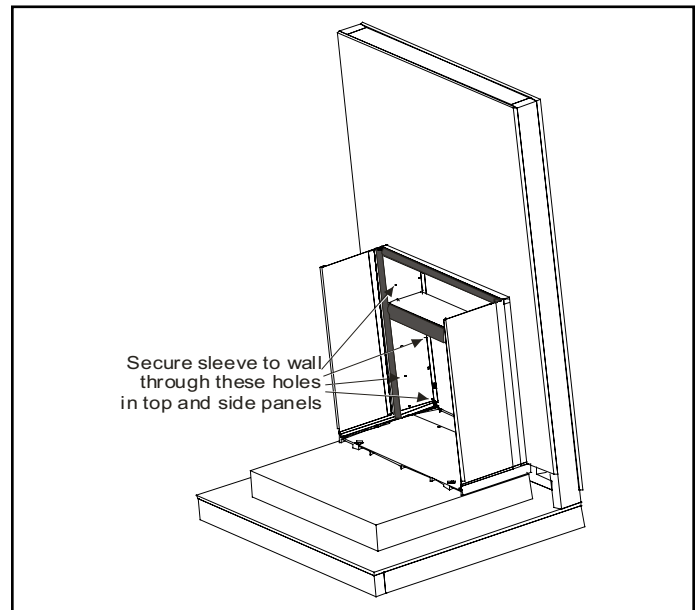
Securing Wall Sleeve to Wall Opening (if mounting angles were not installed)
